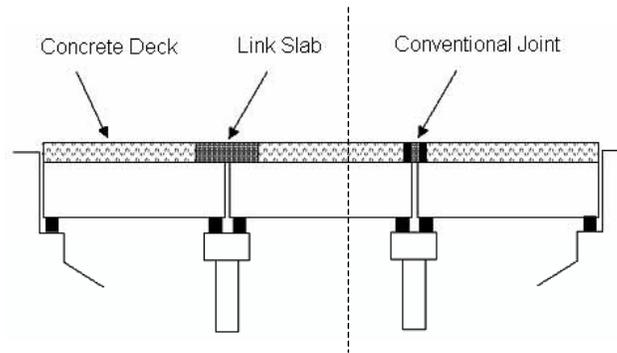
Bridge deck with ECC link slab and conventional mechanical steel expansion joint
